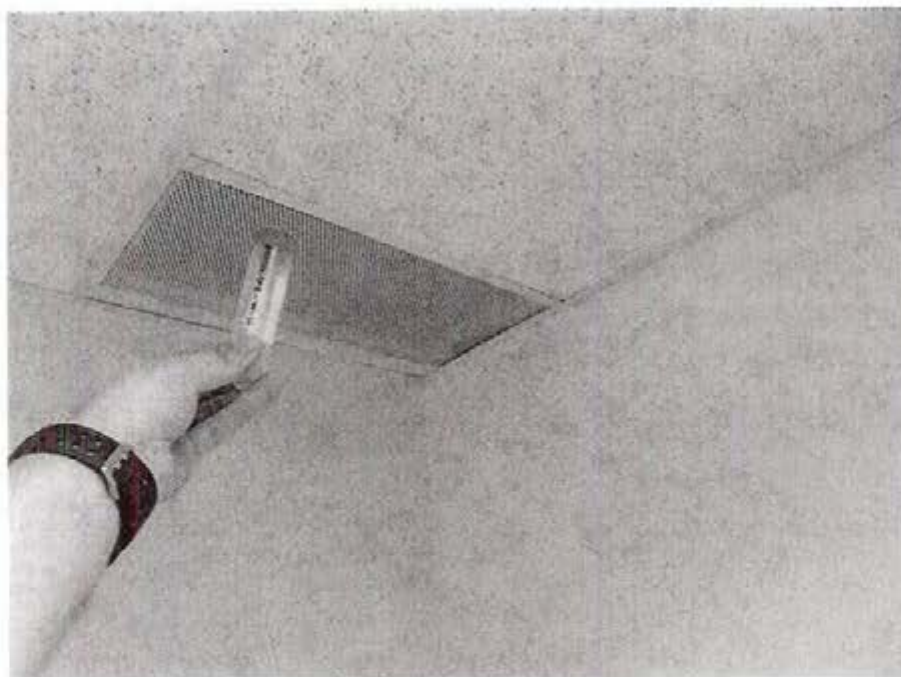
Lead wipe sample (042414-IFR-W-11) collected from a return air vent in the copy room.
